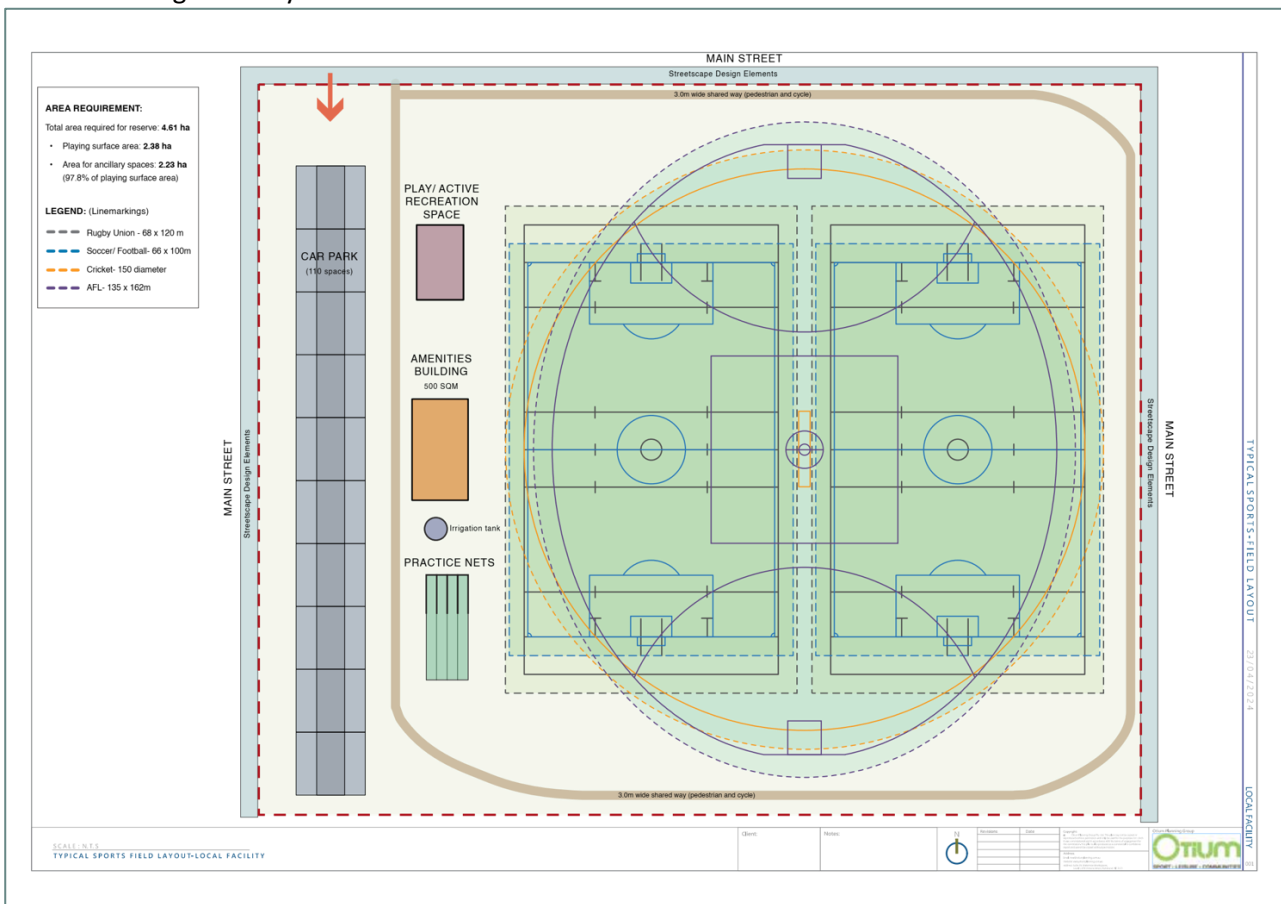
Typical Minimum Indicative Layout for Playing Fields
